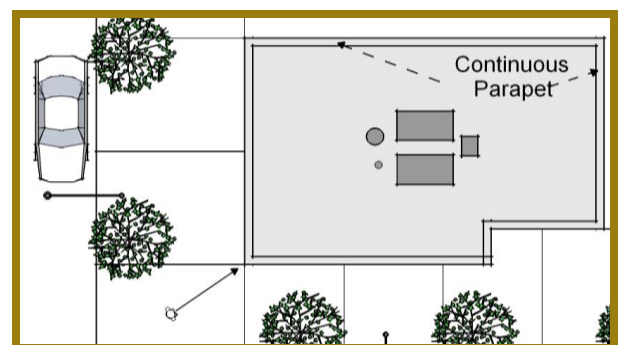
Rooftop equipment on this building is clustered near the centre of the roof, away from the street and other public spaces
